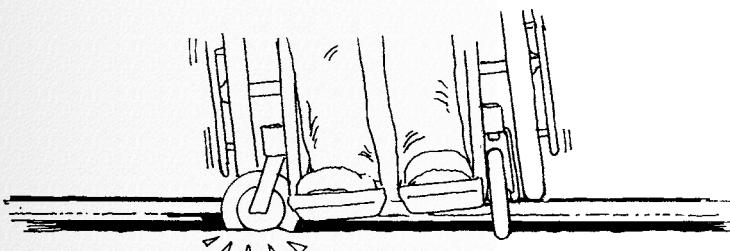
PROBLEM: Wheelchair casters may get stuck in railroad flangeways.
